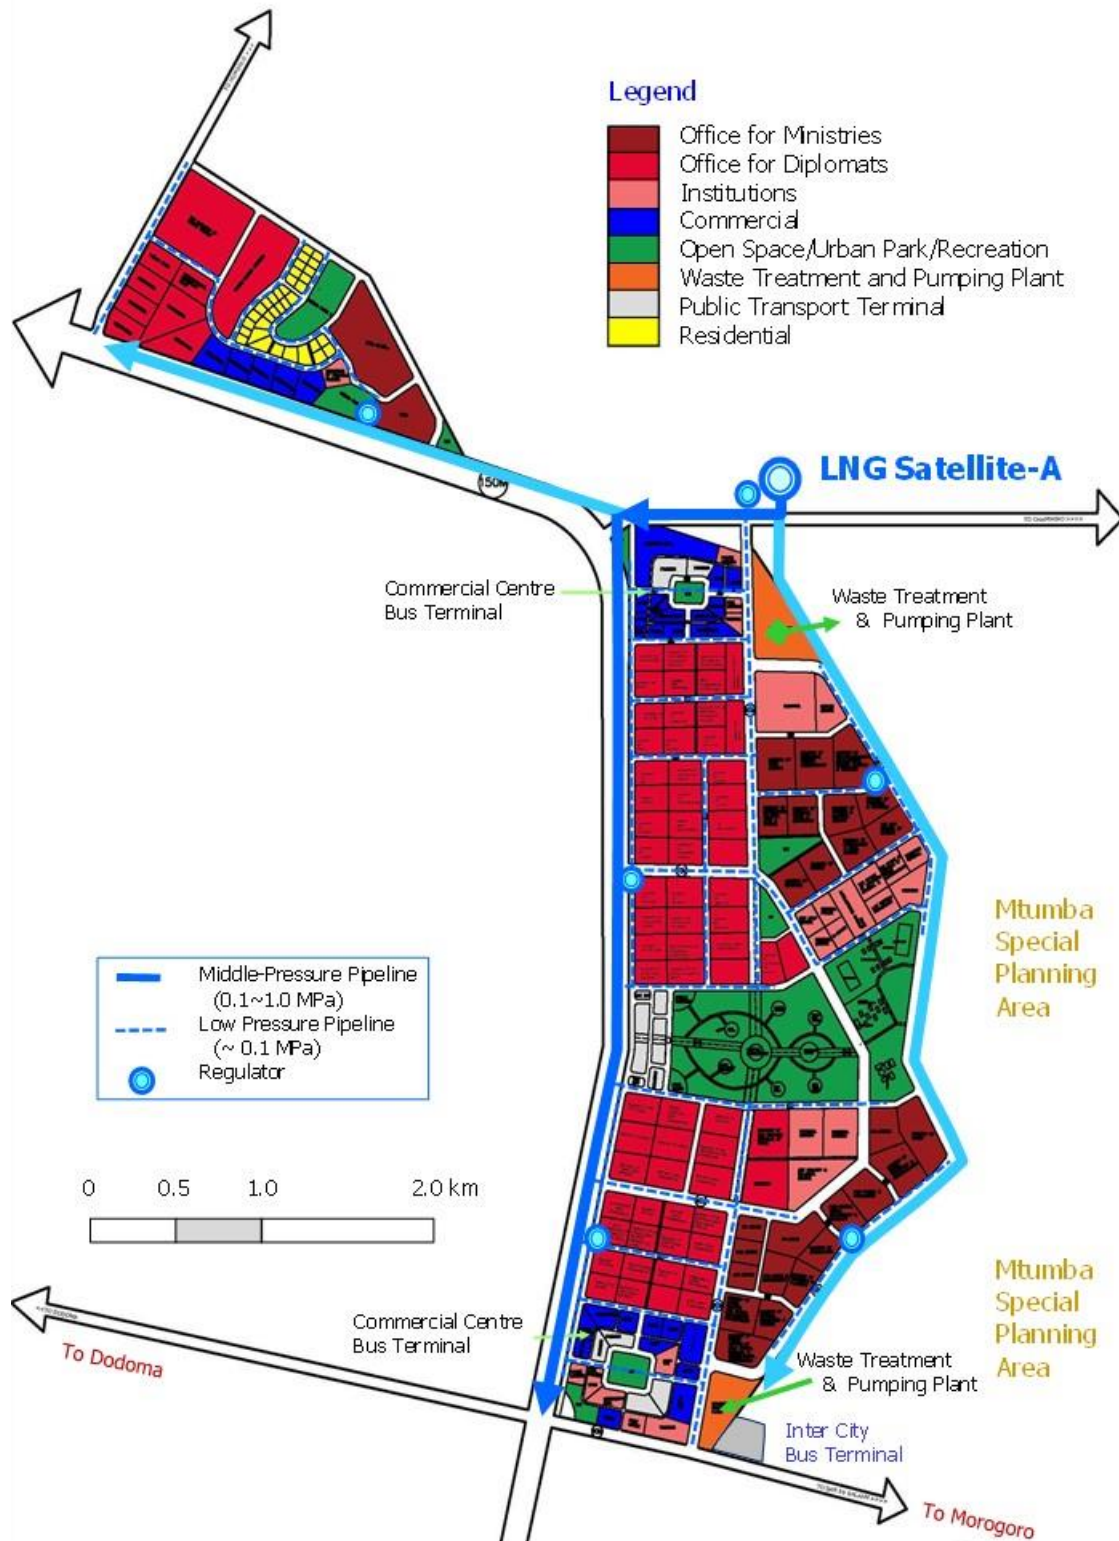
shows a plot plan of the gas pipeline installation. As the New Government City is being developed in the suburbs open space, it is possible at present to draft an ambitious and flexible plan such as introducing CHP (Combined Heat and Power) at large government offices and public facilities as providers of an anchor gas demand with high energy efficiency. In addition, there is no need to dig up roads, suggesting fewer construction problems and shorter work time compared to the established urban areas.
